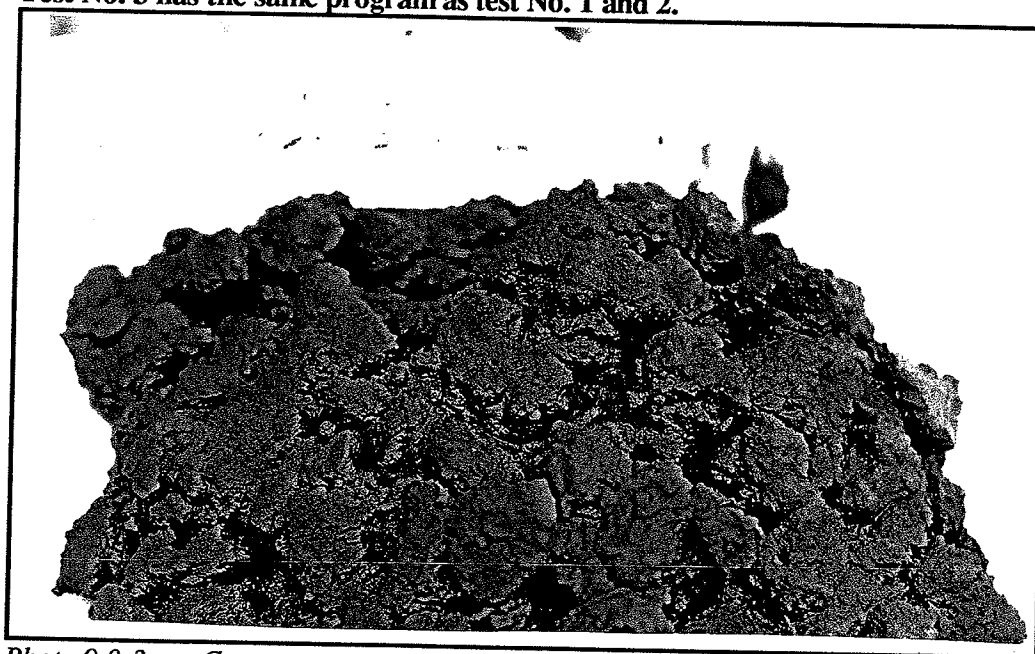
Concrete type used at test No. 3. (F3 negative No. 27)
